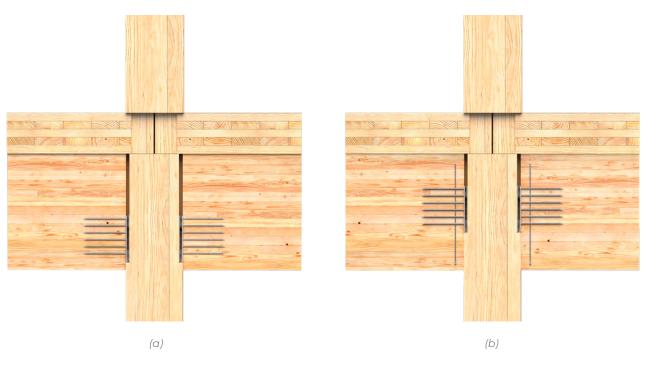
(a) Beam Hanger Without Reinforcement (b) Beam Hanger With Reinforcement
